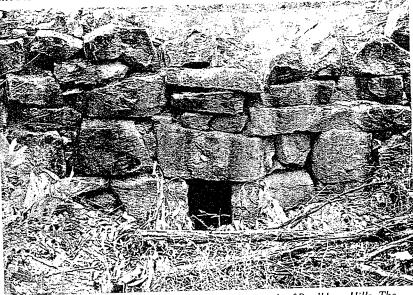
Culvert outlet and retaining wall, 40.4km north of Baulkham Hills. The small scale and low standard of the work are typical of the early construction period (1828-28).
